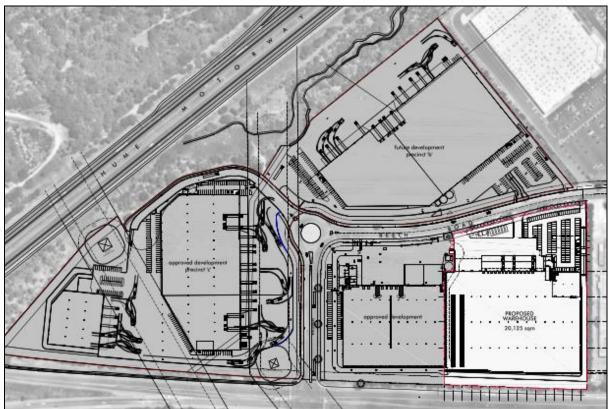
Extract of Locality Masterplan and location of proposed warehouse modifications
